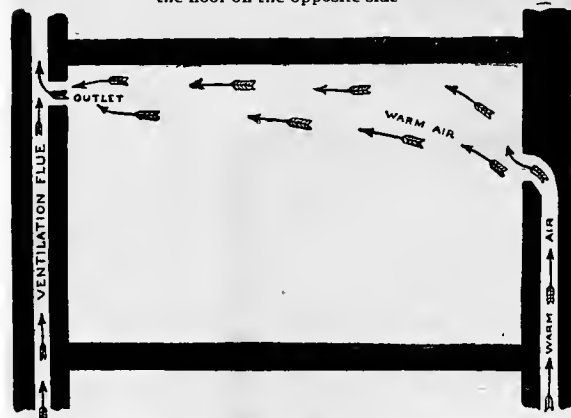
Gravity system, with inlet high and outlet high and opposite
